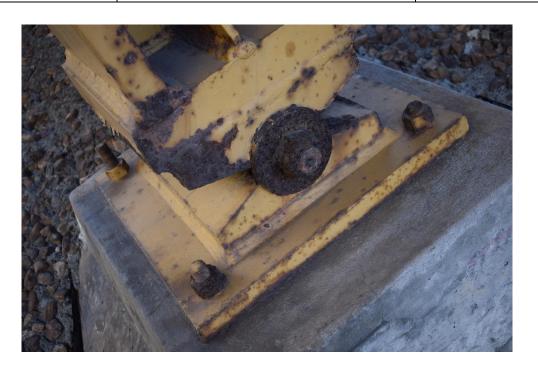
Pier N3 Bearing, Corrosion on Pin Washer and Rocker Plates 3.4.2 Abutment Bearing and Bearing Shelf Observations
